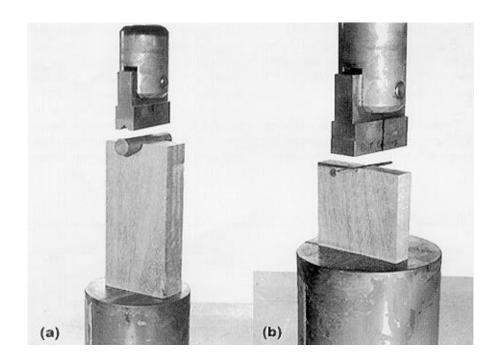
Dowel-bearing test setup: a) bolt-bearing test and b) nail-bearing test.
